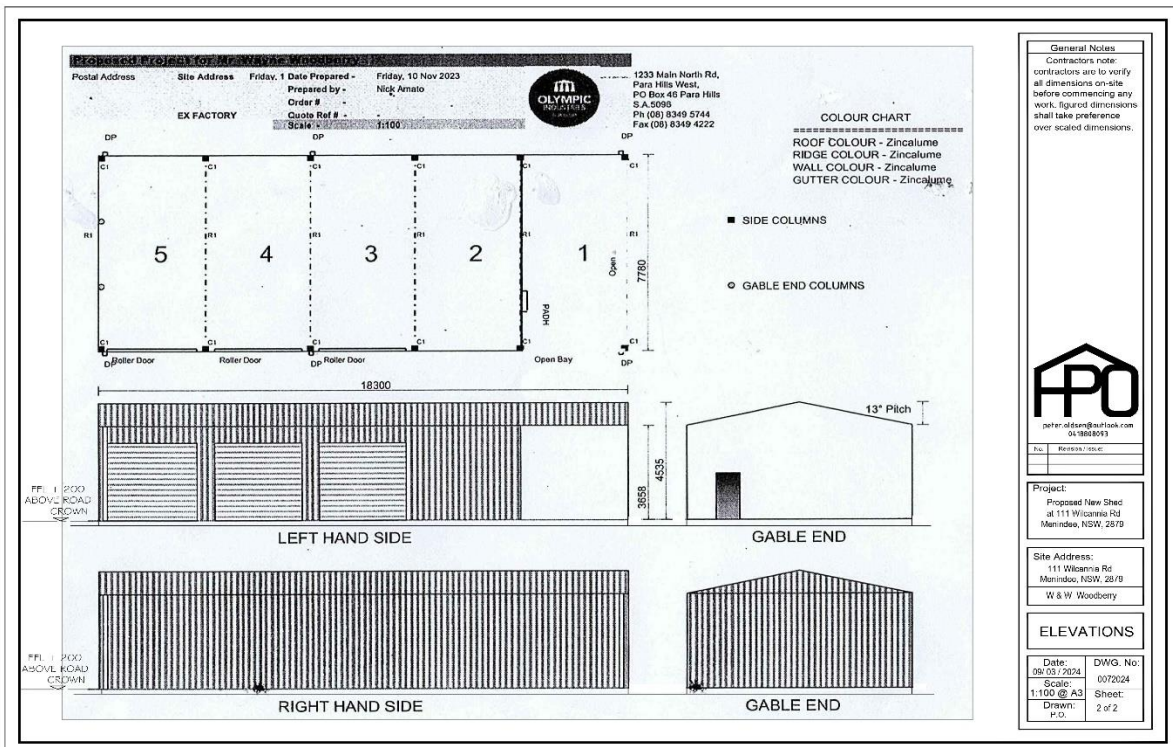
Elevations Proposed Shed & Carport Lot 751 in DP 761876 Wilcannia Road Menindee
